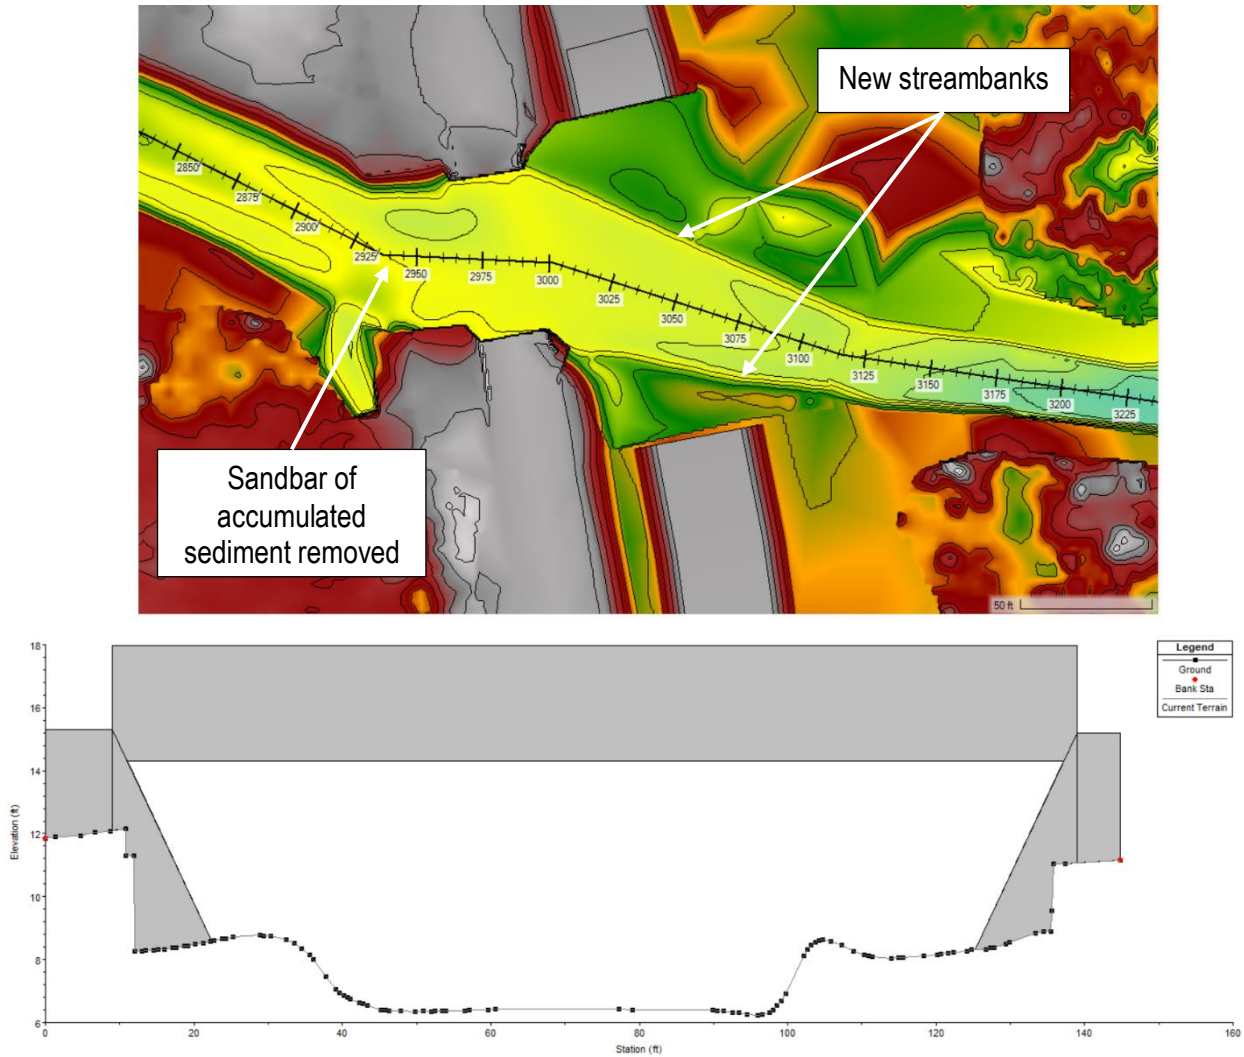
Proposed Waiahole Stream Bridge – Alternative 1: 130-foot span.
